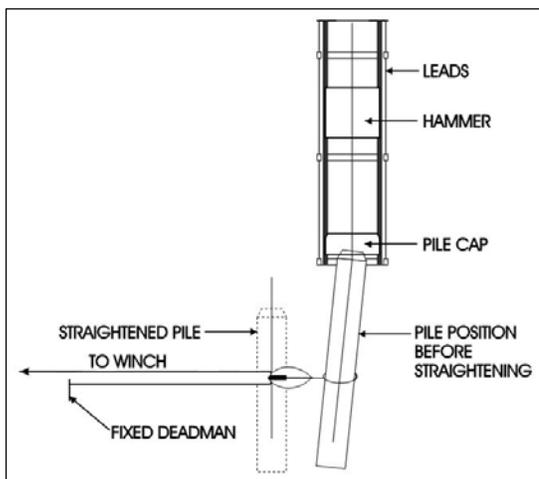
17: Straightening a Timber Pile with Block and Tackle
